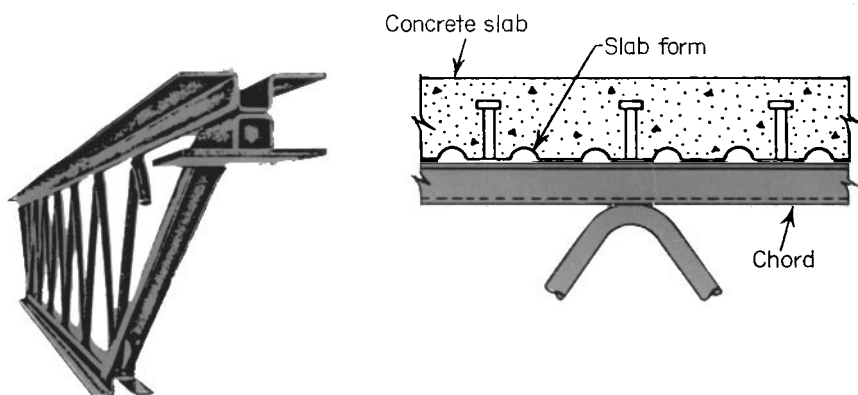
Composite joist using steel-deck-reinforced concrete slab.^{1.96}
